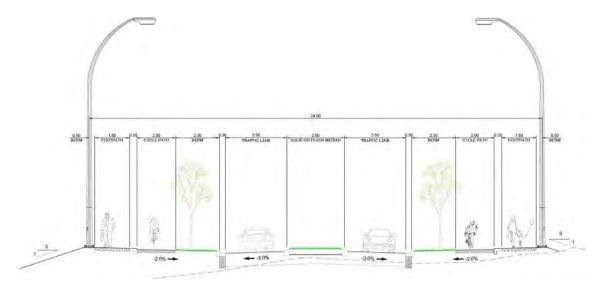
Typical Cross Section for Ponga Road included within the Drury Arterial Network DBC
